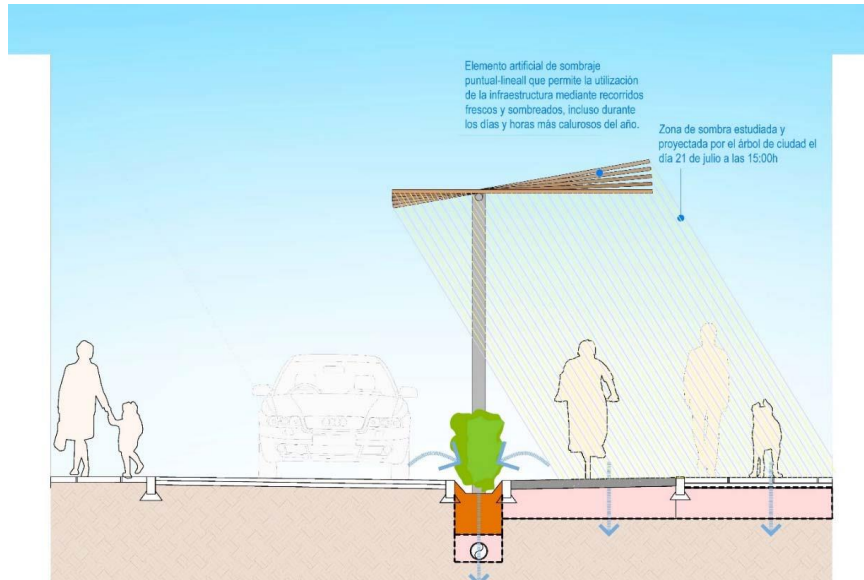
Infographic of the design of the shade structures placed in Alcantarilla.
